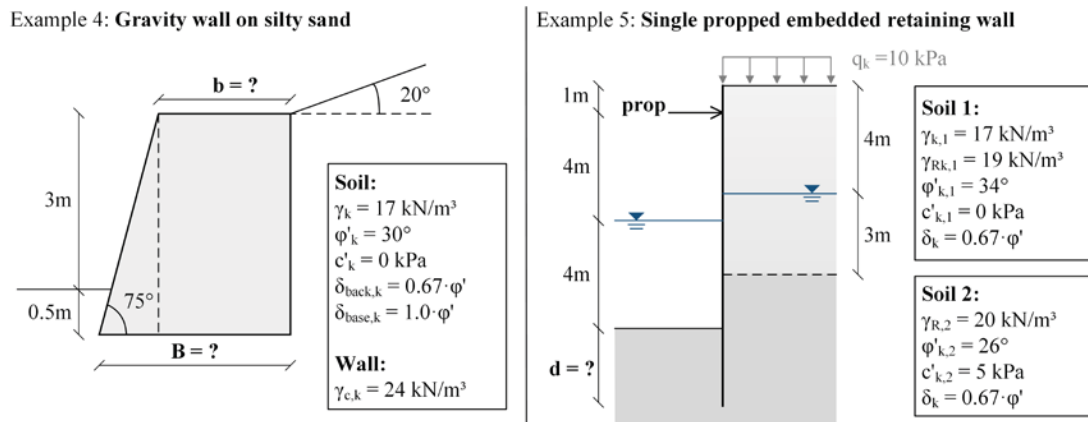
Design examples: a gravity wall on silty sand (left) and a single propped embedded retaining wall (right).
